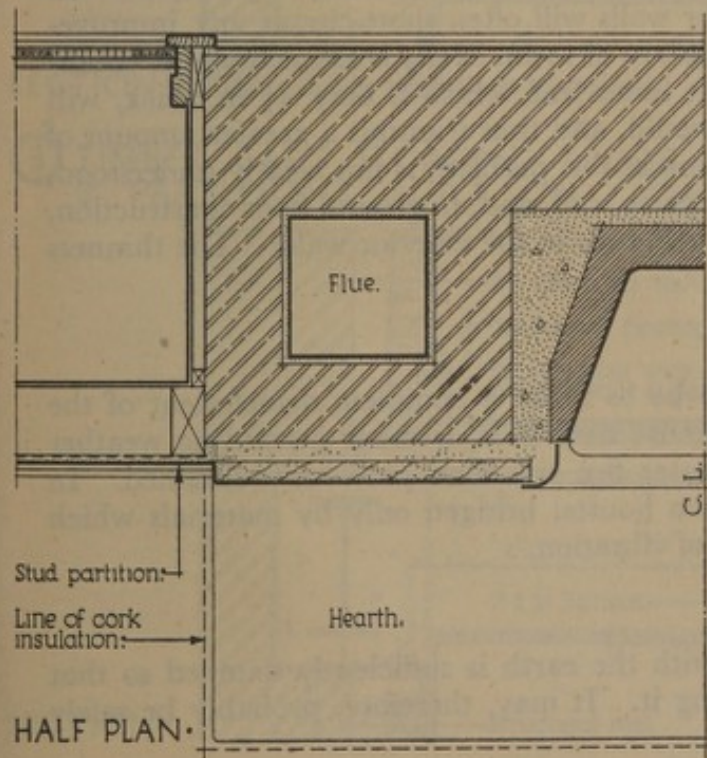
DETAILS OF FIREPLACE ·A· ON PLAN SECTION ON C.L. ·
